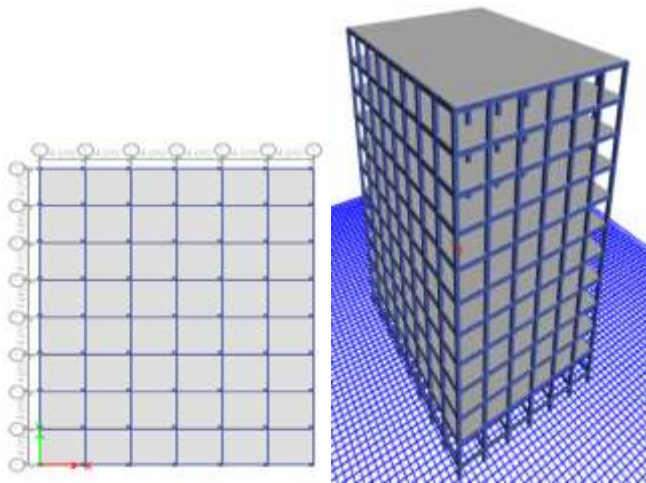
Plan elevation & 3D view for 0% slab opening without shear wall.
